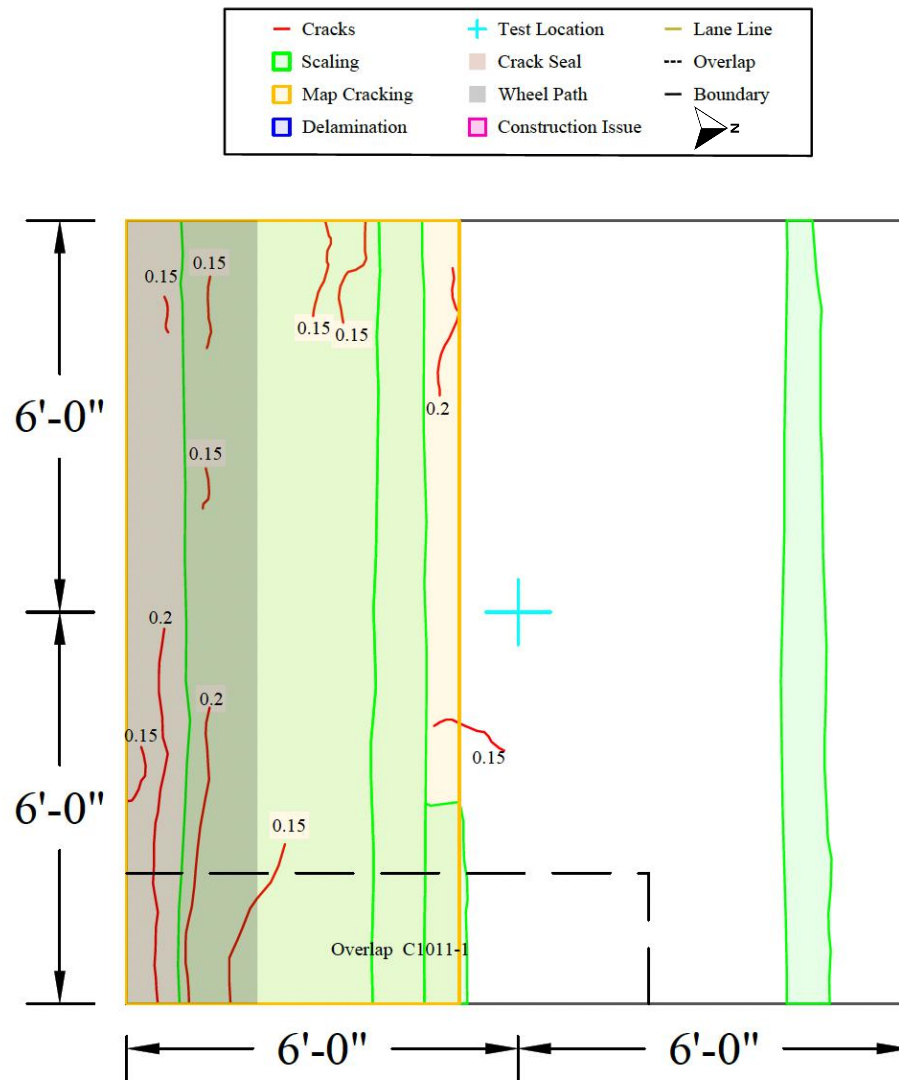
Test location 2 of lightweight concrete deck at bridge C-1011.
